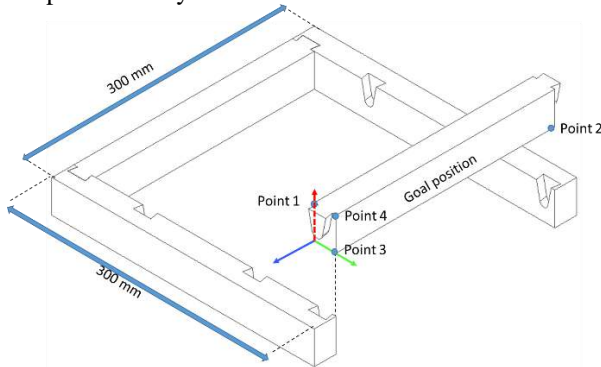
Prefabricated module mockup used for the assembly in laboratory environment experiments
